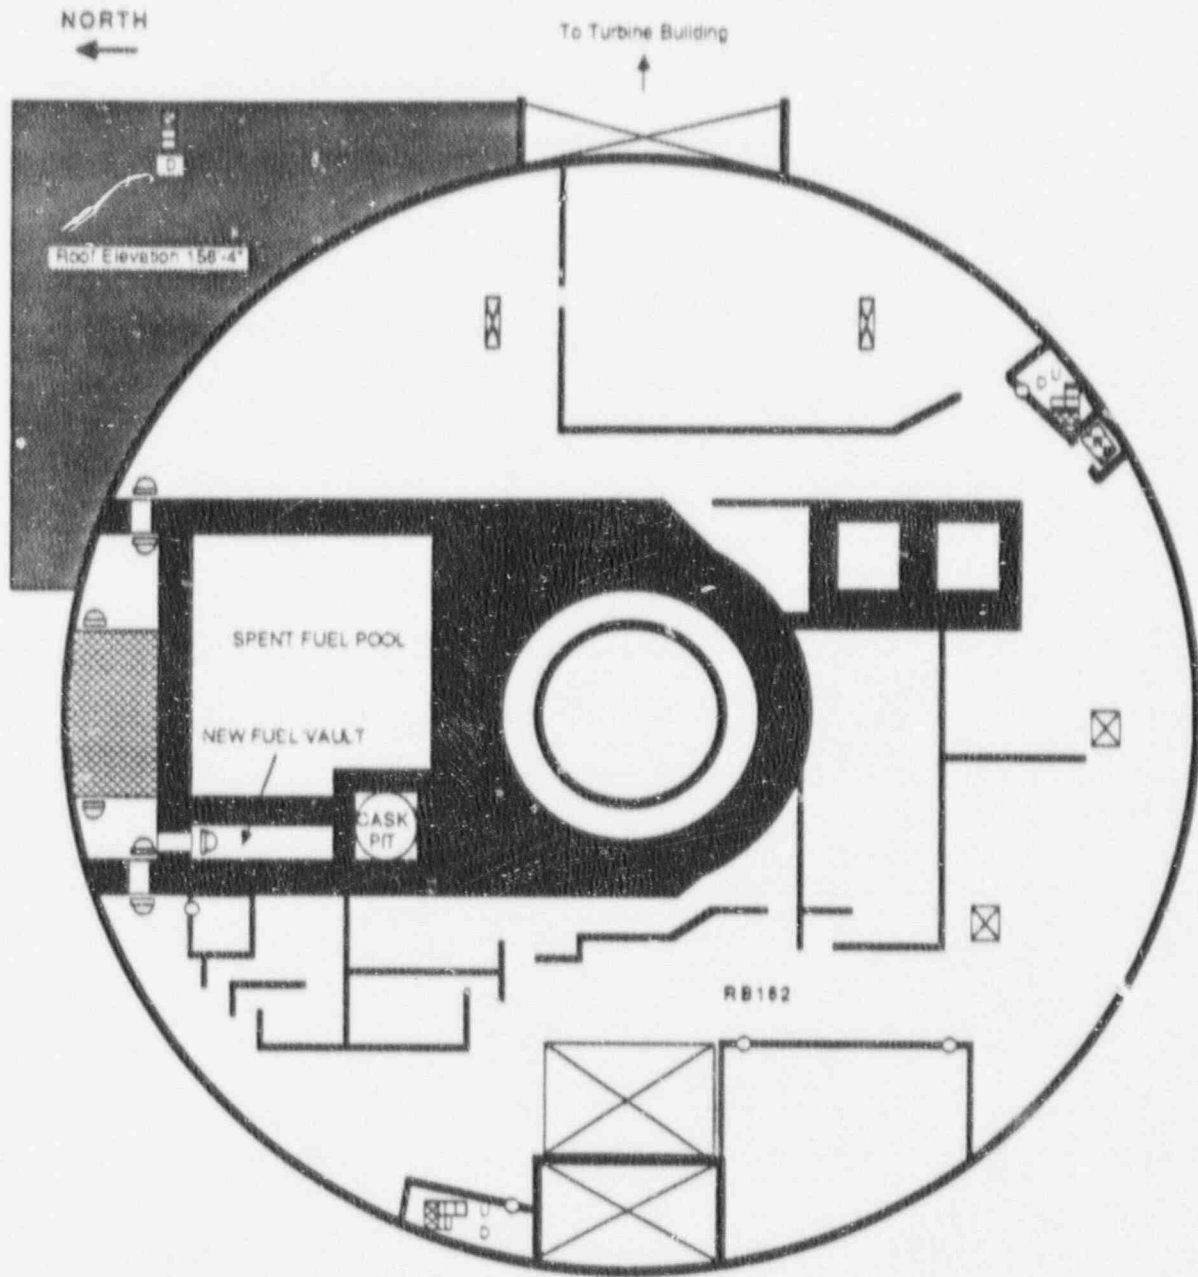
Hope Creek Reactor Building Elevation 162'-0"
